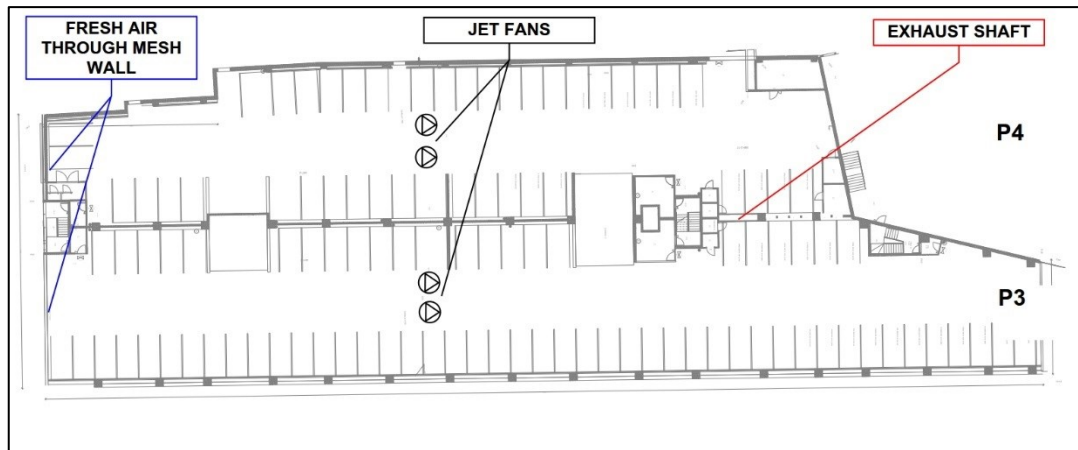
Floor plan and ventilation configuration for decks P4, P3
